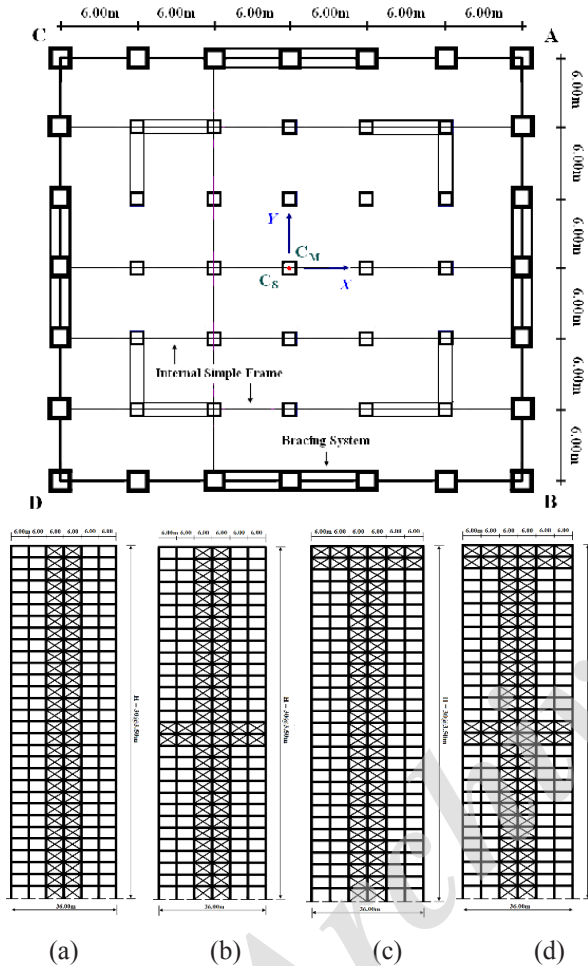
The plan and elevation of the studied structures, CM: mass center, CS: shear center; a) model without belt truss; b) model with middle belt truss; c) model with top belt truss; d) model with middle and top belt trusses
